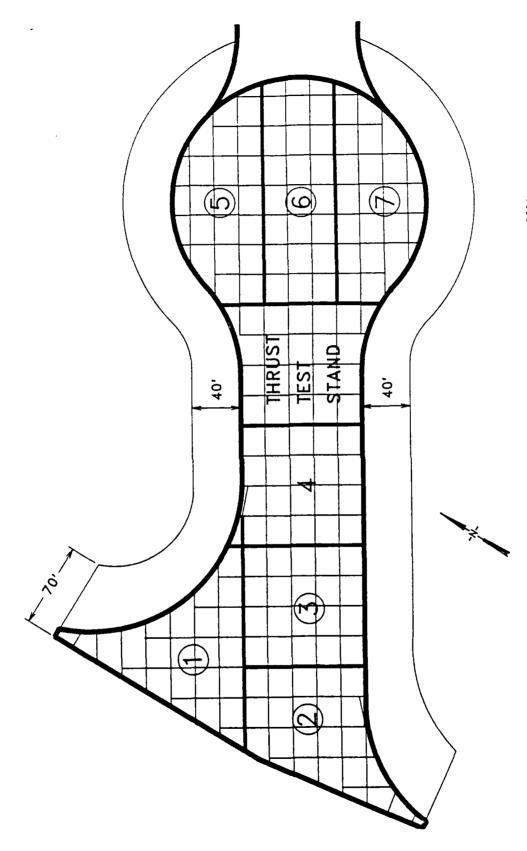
Sample unit layout, Pad 18 thrust stand (feature A28B)
